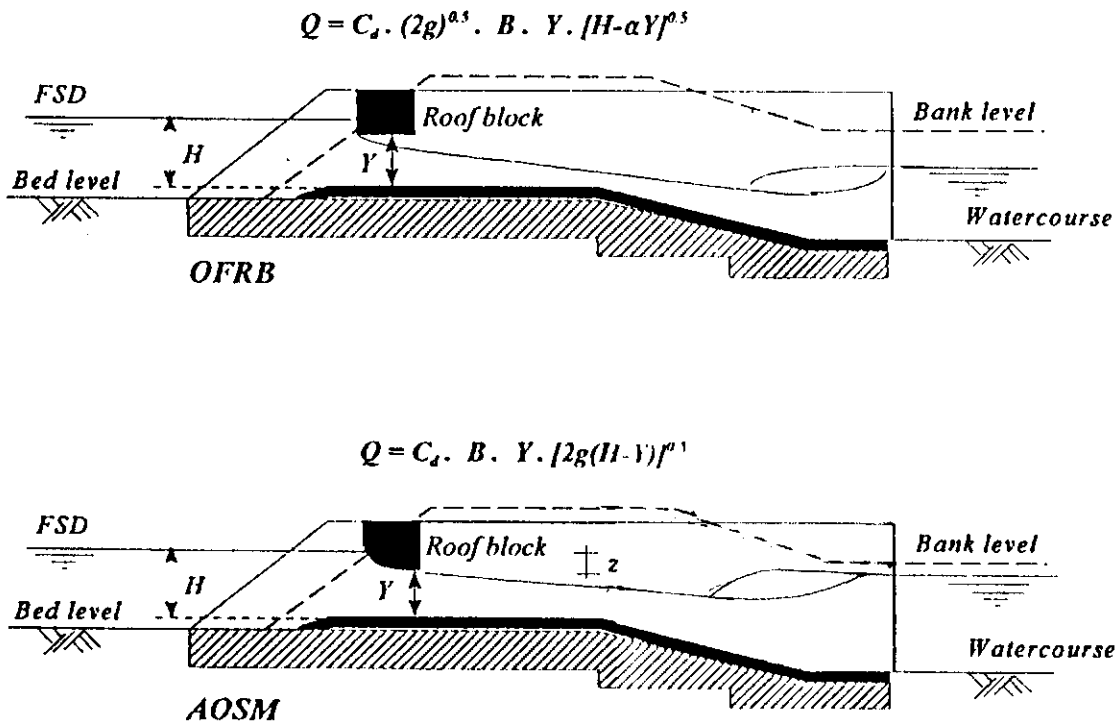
Orifice flow for OFRB and AOSM outlet structures.
